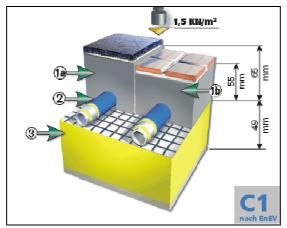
Standard wet floor heating system for construction floors that are in contact with the outside or unheated zones (package to be added to the construction floor):
